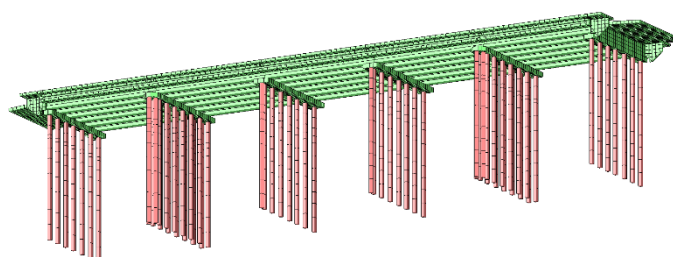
Bridge layout for Option No. 1 (new bridge elements are shown in green, existing piles are shown in red)
